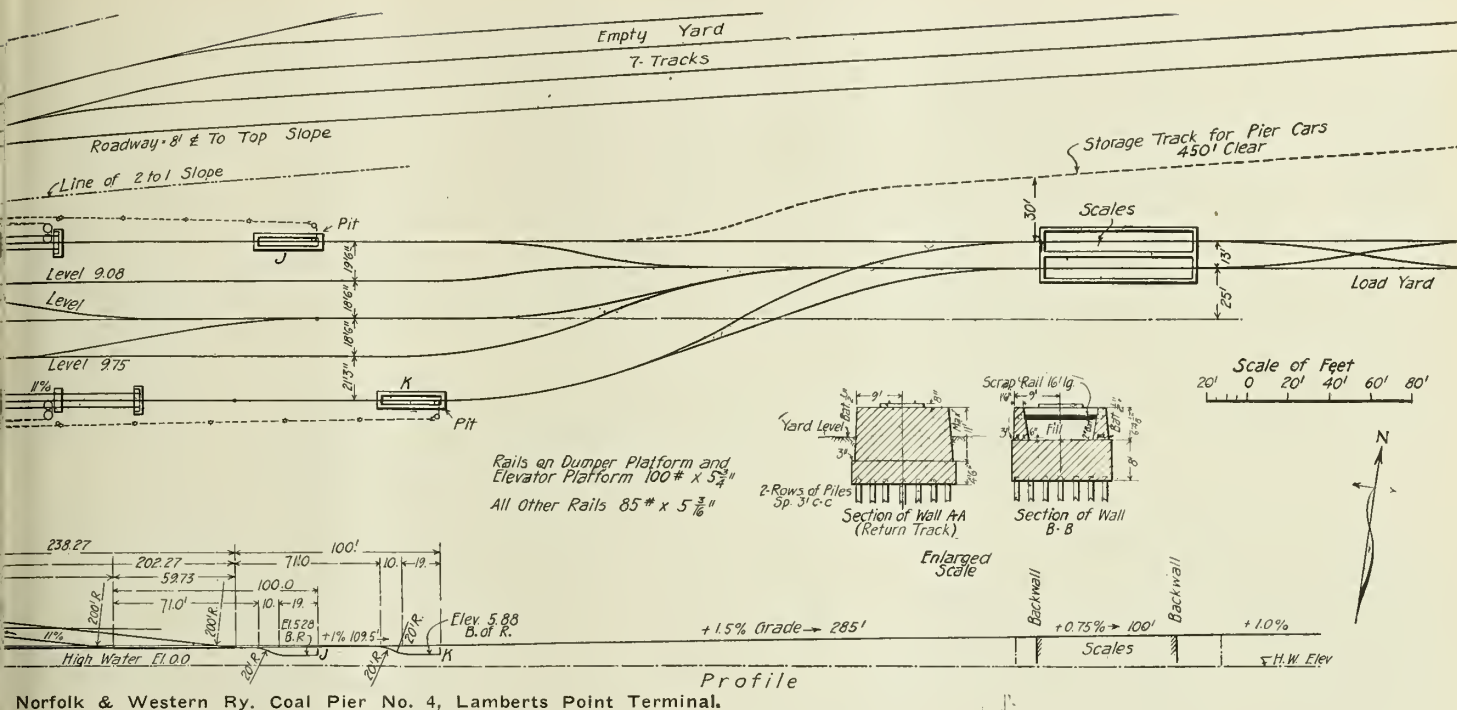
Situation Plan of New Coal Pier No. 4, Lamberts Point Terminal, Norfolk & Western Ry., Together with Details of Design of Bulkheads and Breakwater.
